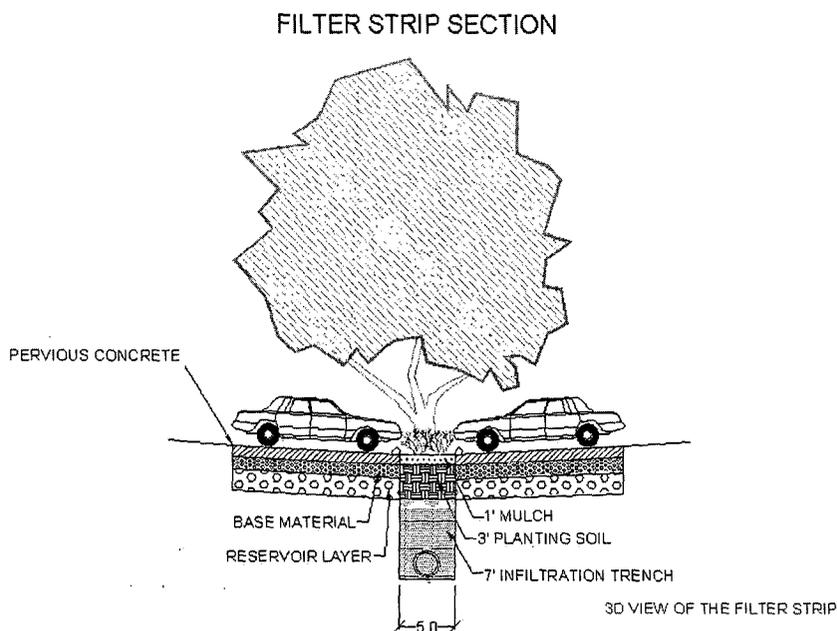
Planting island with pervious concrete, filter strip, and infiltration bed to promote better tree growth through increased soil volume and enhanced on-site stormwater retention.
